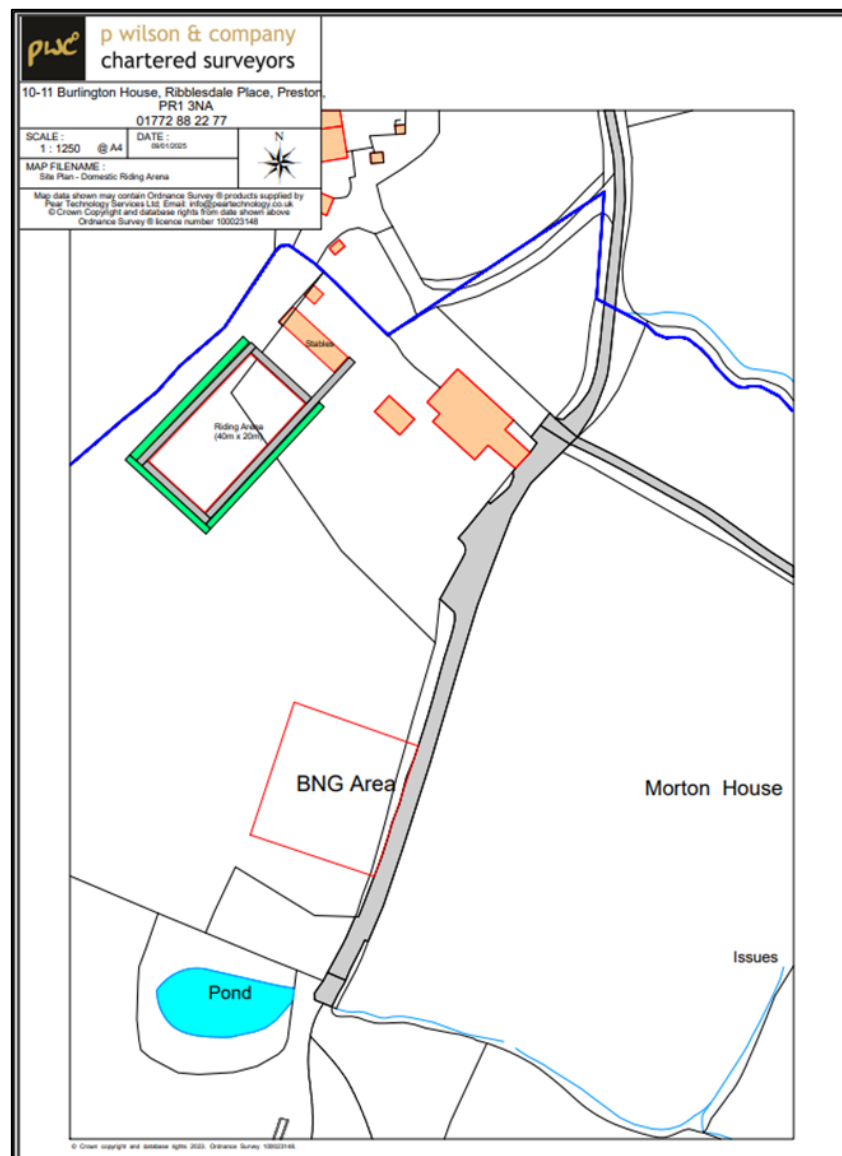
Proposed site location plan outlined in green, within wider site ownership blue line boundary (© P Wilson & Company)
